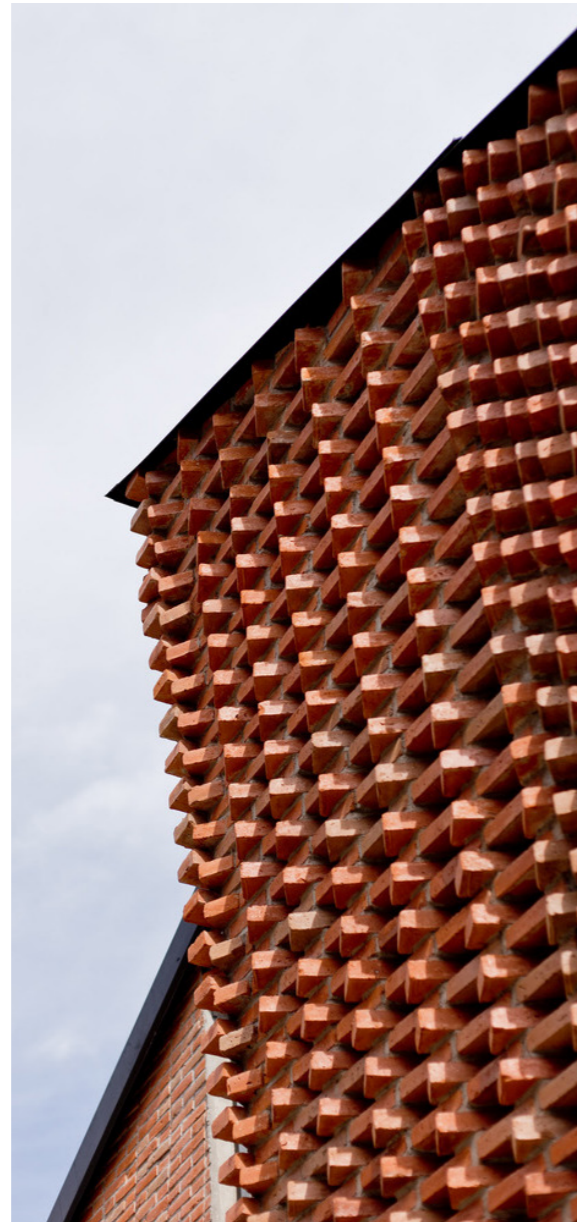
Saint Peter House - Brise Soleil Elevation Detail (ArchDaily. 2018)
